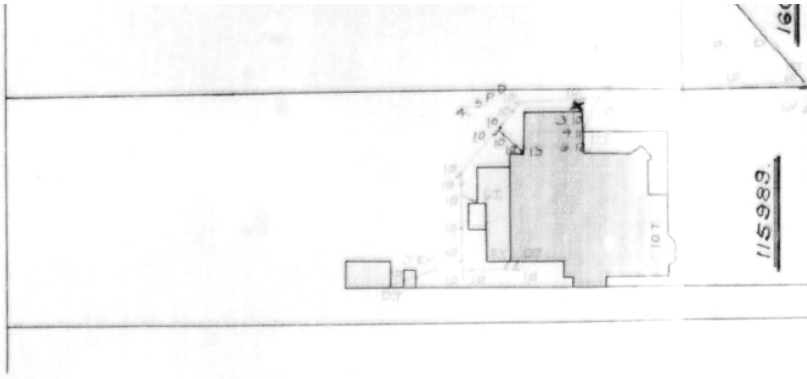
Plan of the subject site dated March 1957, showing a footprint of the house and outbuildings, annotated with sewerage works (Source: SEW, Drainage Plan No. 115989)
